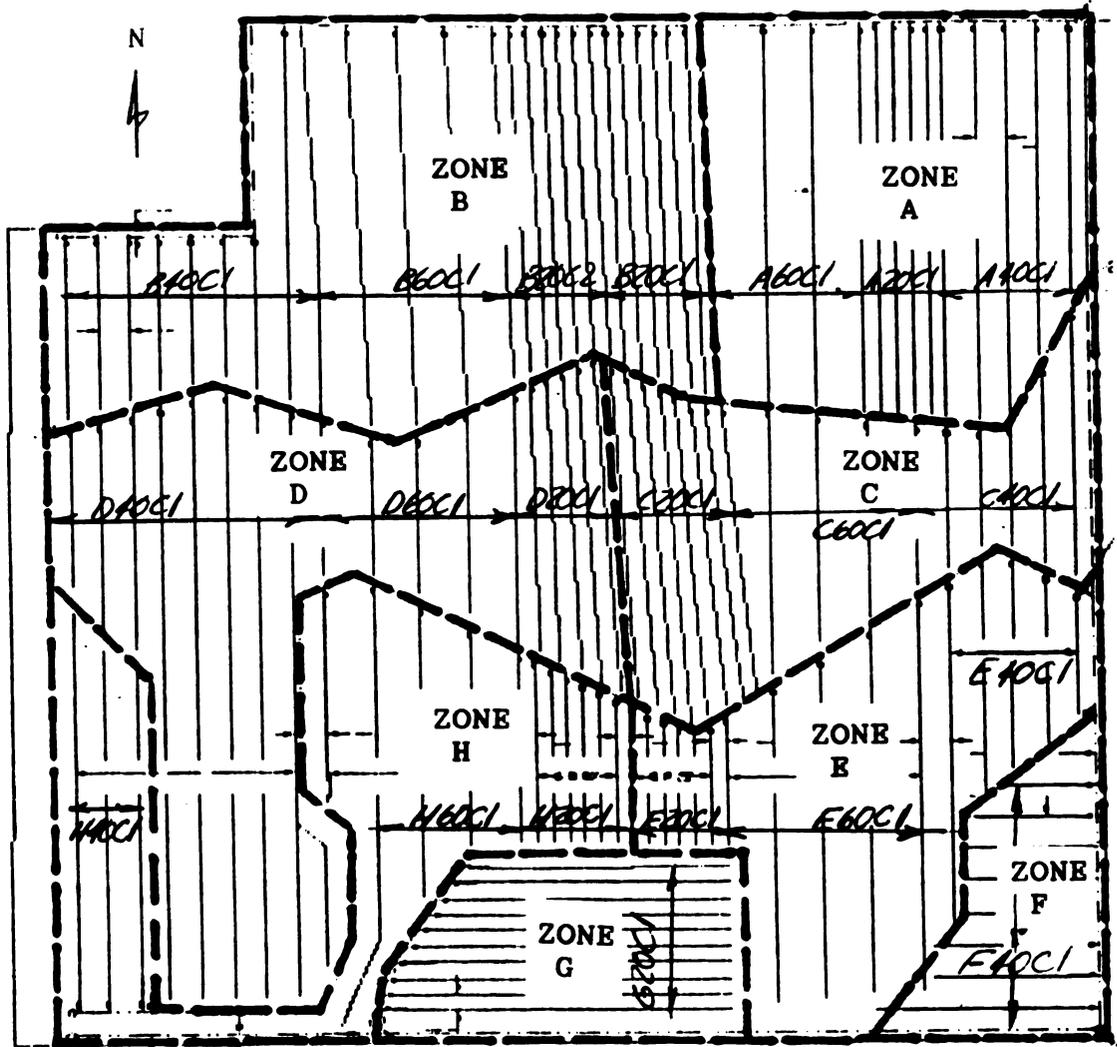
Bannister site water management zones (A through H), subsurface drainage pipe layout (lateral spacing 6, 12, 18 m) and treatments within each zone (for example A40C1).
